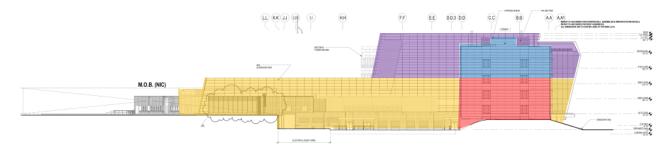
STRUCTURAL STEEL ERECTION WEST ELEVATION
